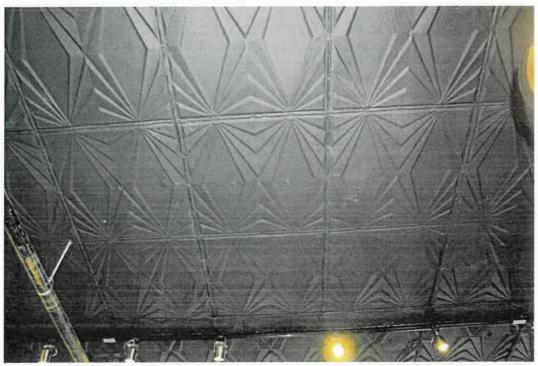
Restored pressed tin ceiling at first floor commercial space
